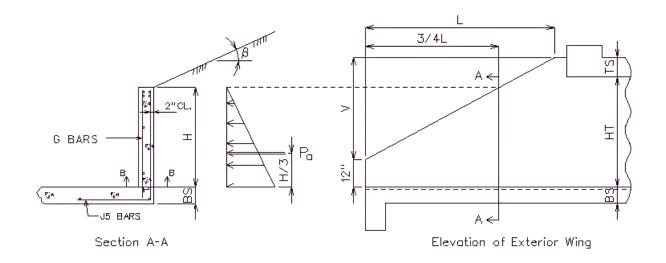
Elevation and partial cross section of wing
